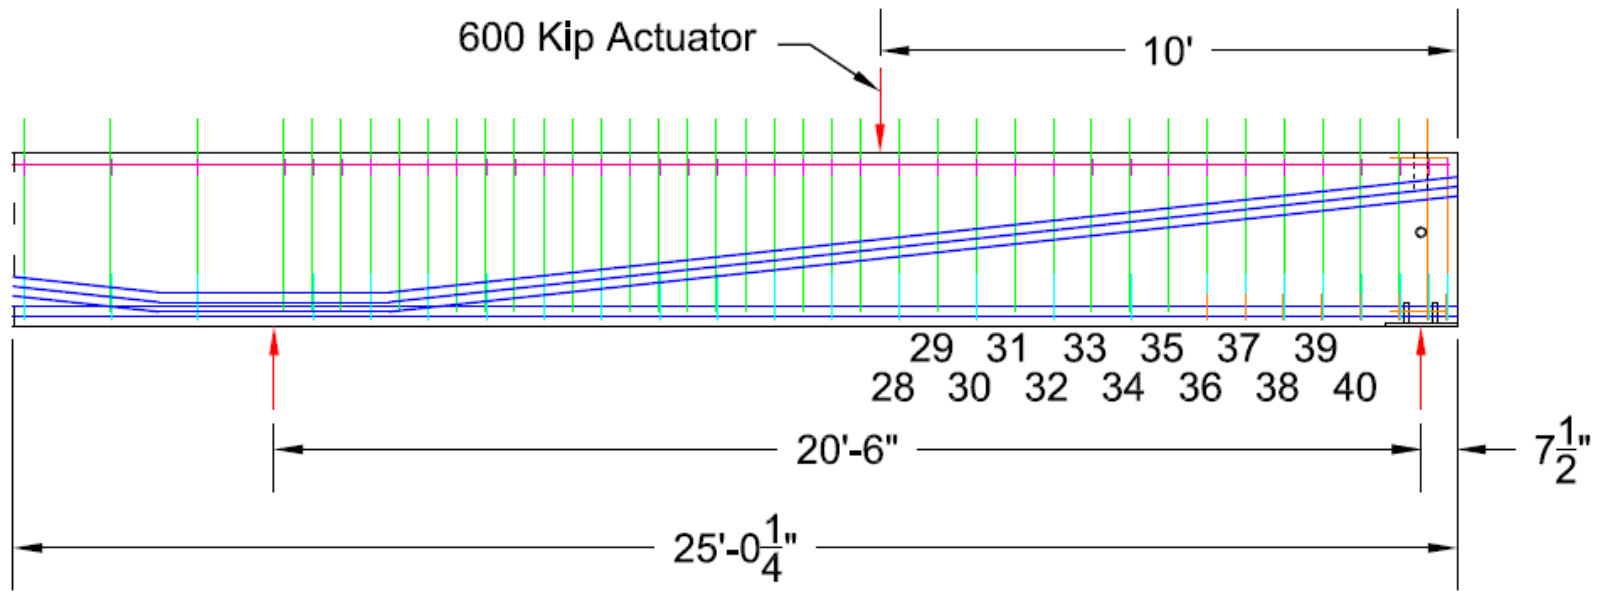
Elevation view of 36M_8W girder including load point location and nominal span length.
